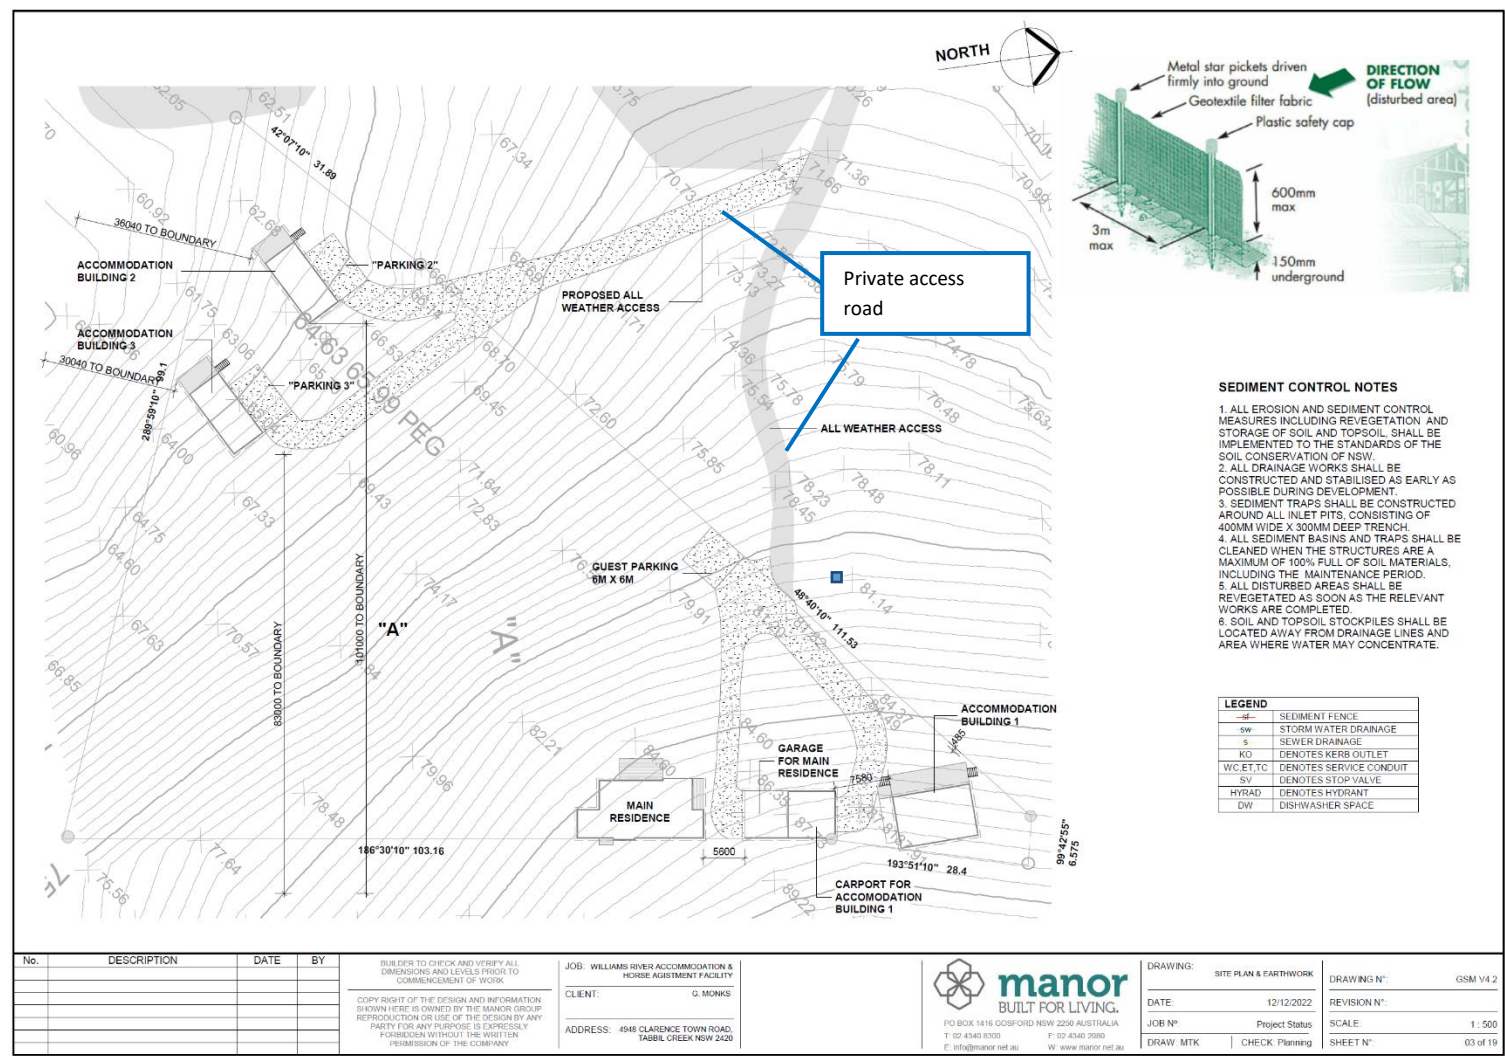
Site Plan showing locations of tourist accommodation (STRA) buildings 1-3 and new dwelling
